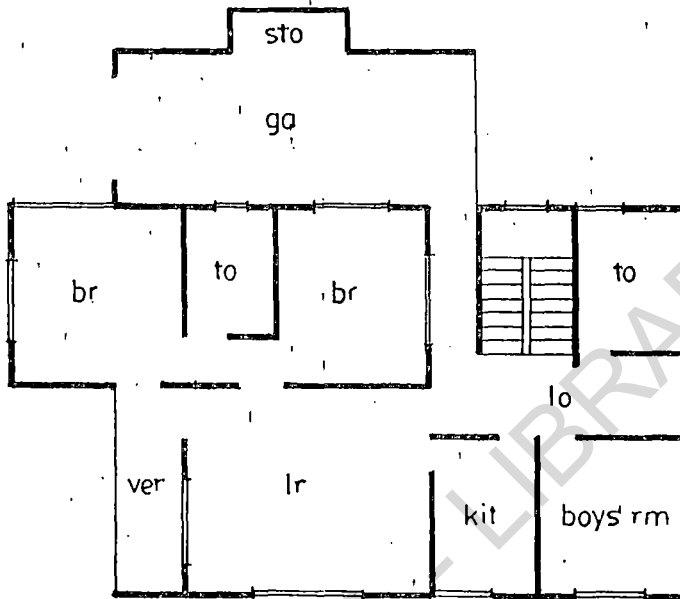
FLOOR PLAN FOR THE 2-BEDROOM HOUSE TYPE WITH BOYS' ROOM AND GARAGE (1:150)
